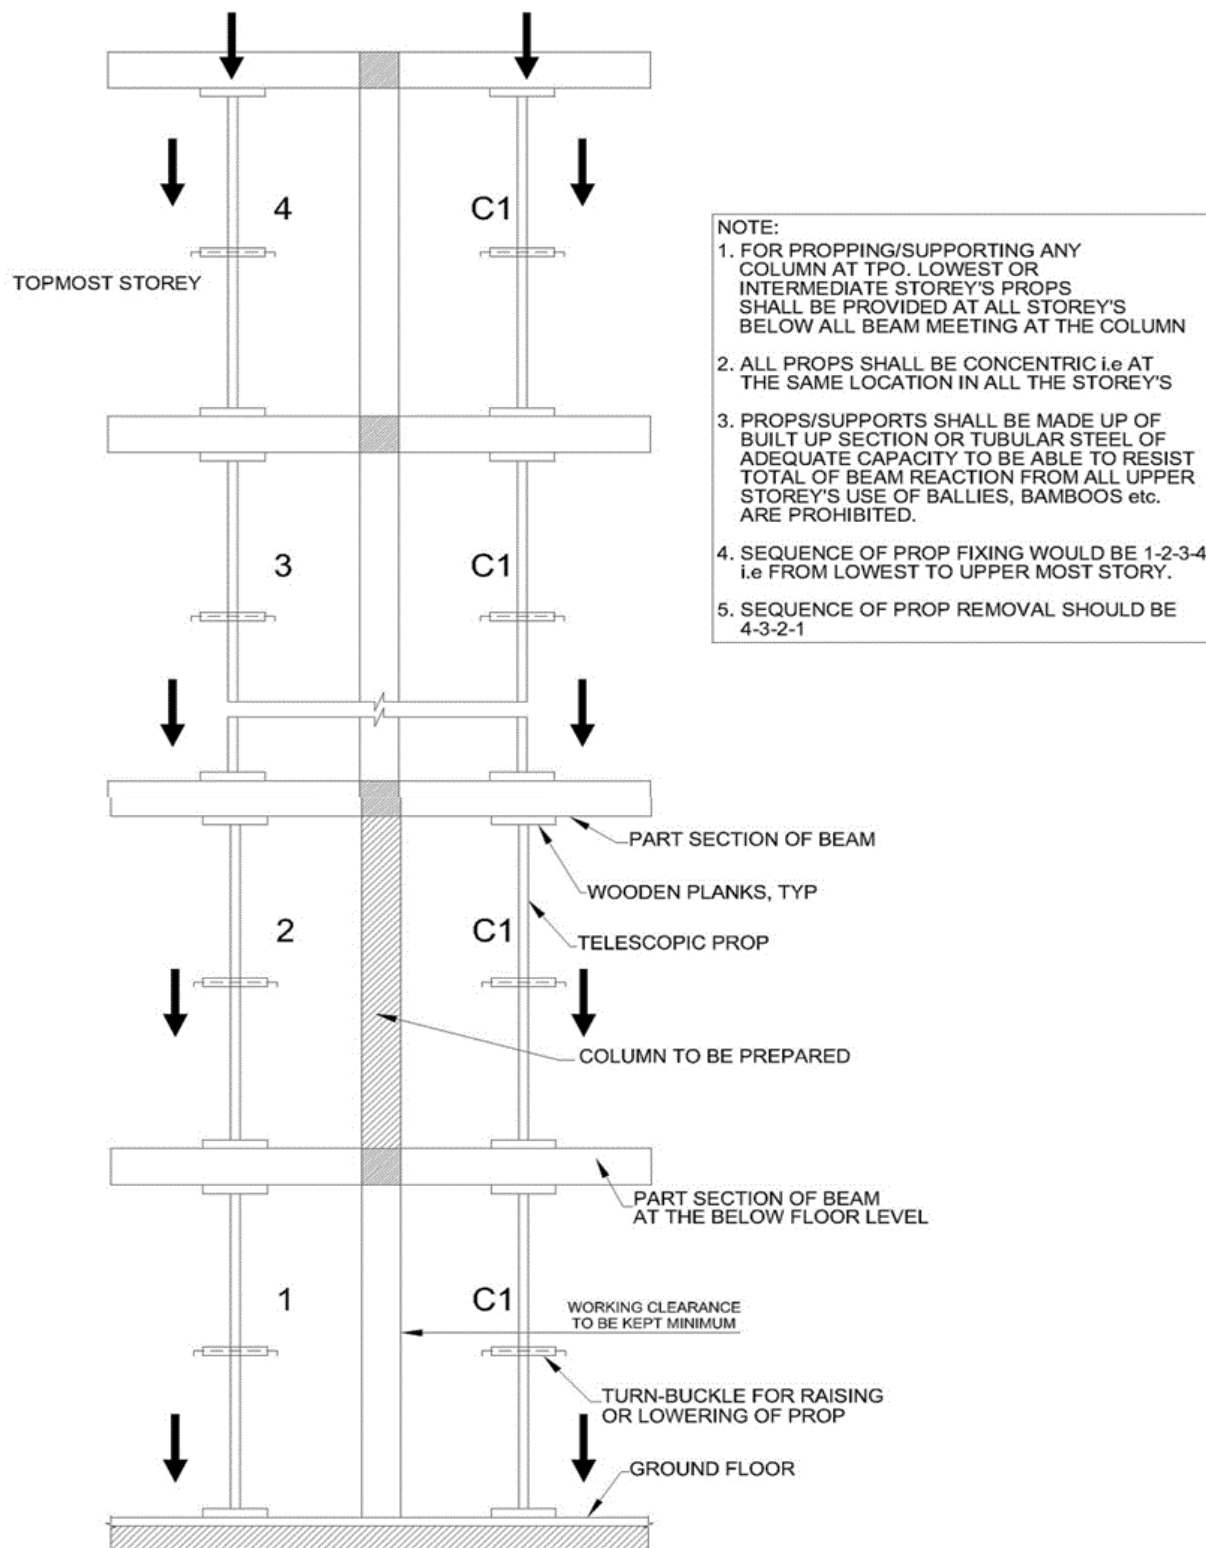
TYPICAL ARRANGEMENT OF PROPPING FOR RELIEVING A COLUMN OF ITS AXIAL LOAD.
